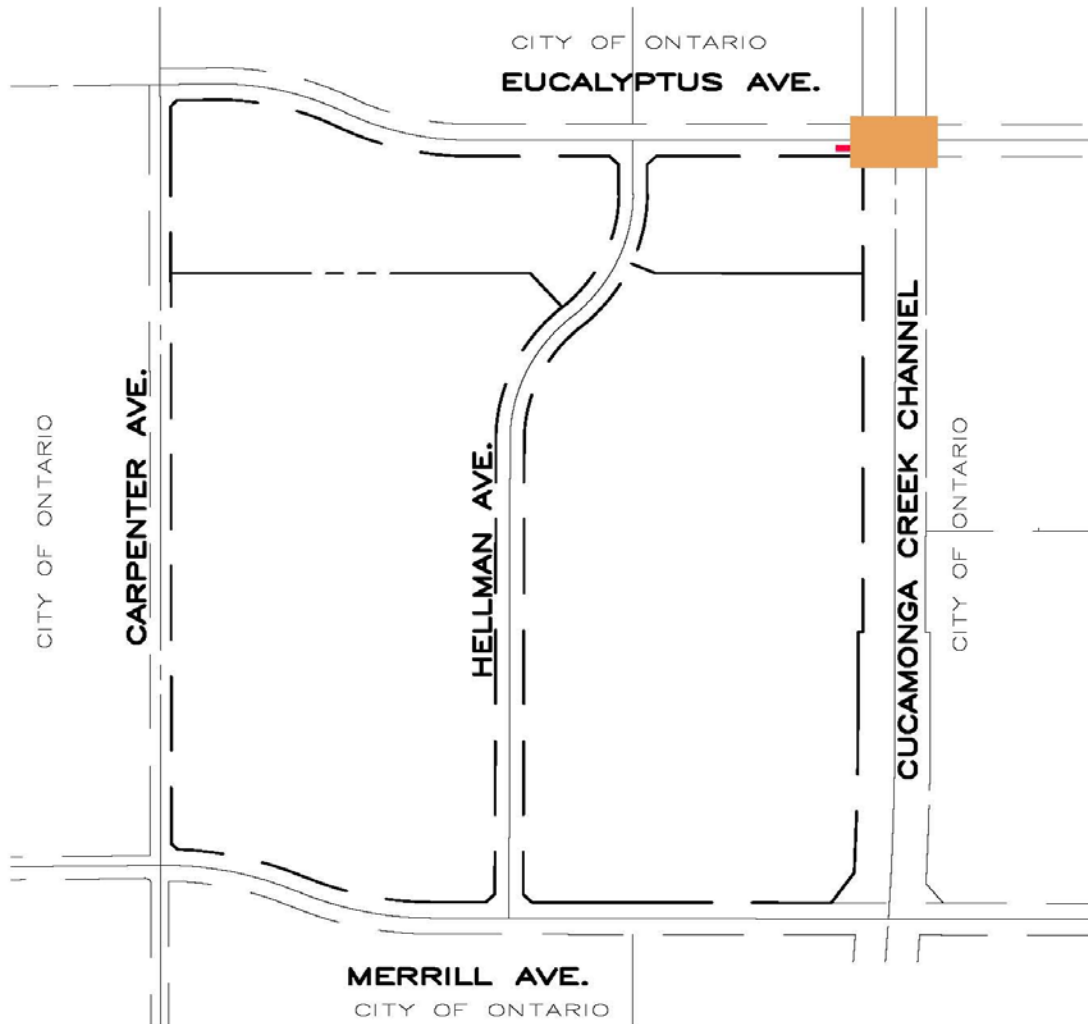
B STREET AND BRIDGE IMPROVEMENTS
